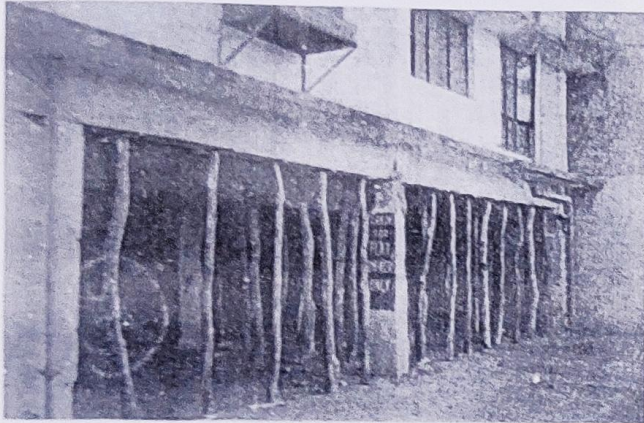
Columns of open bays supporting brick infill walls crushed under overturning forces.
